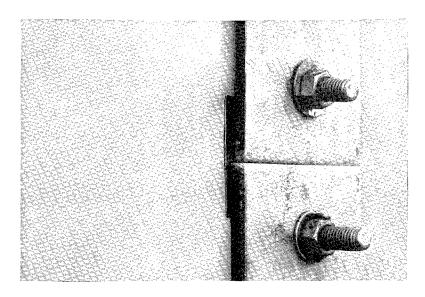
Splice plate provides continuous compression of membrane and gasket across span where profile pieces meet
